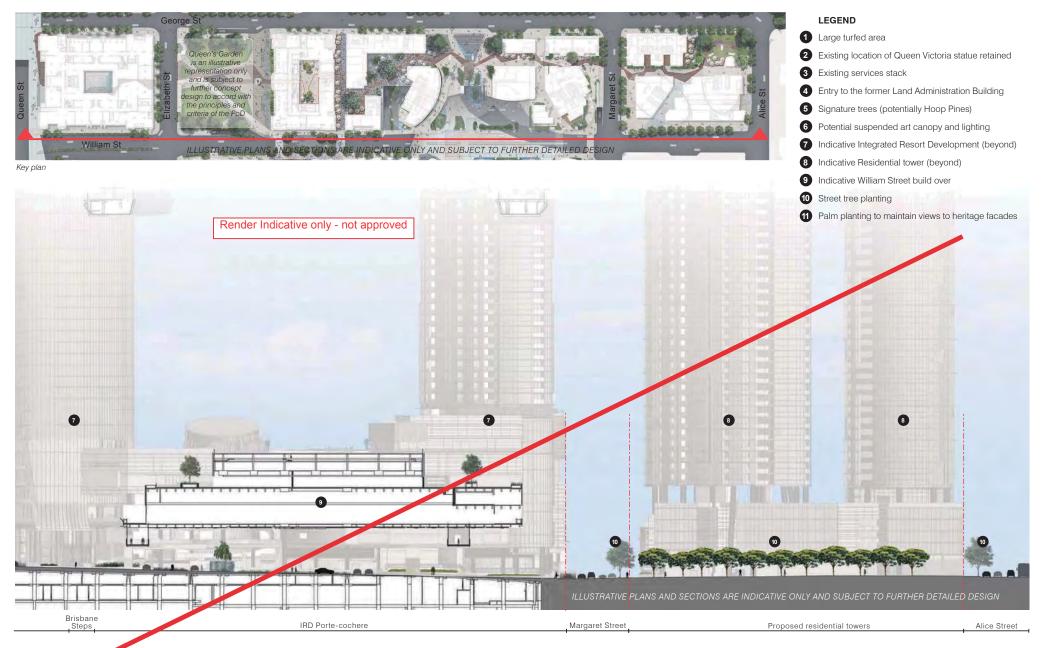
William Street North Sectional Elevation (Not to scale)
